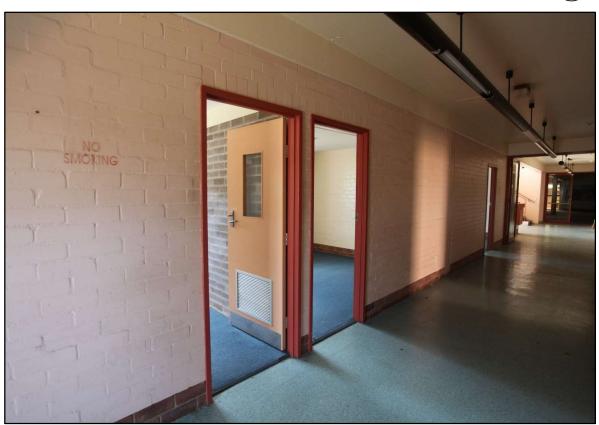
Typical internal design showing a mix of linoleum, carpet, timber doors, painted and face brick with plaster ceilings (Block A – Level 1)
